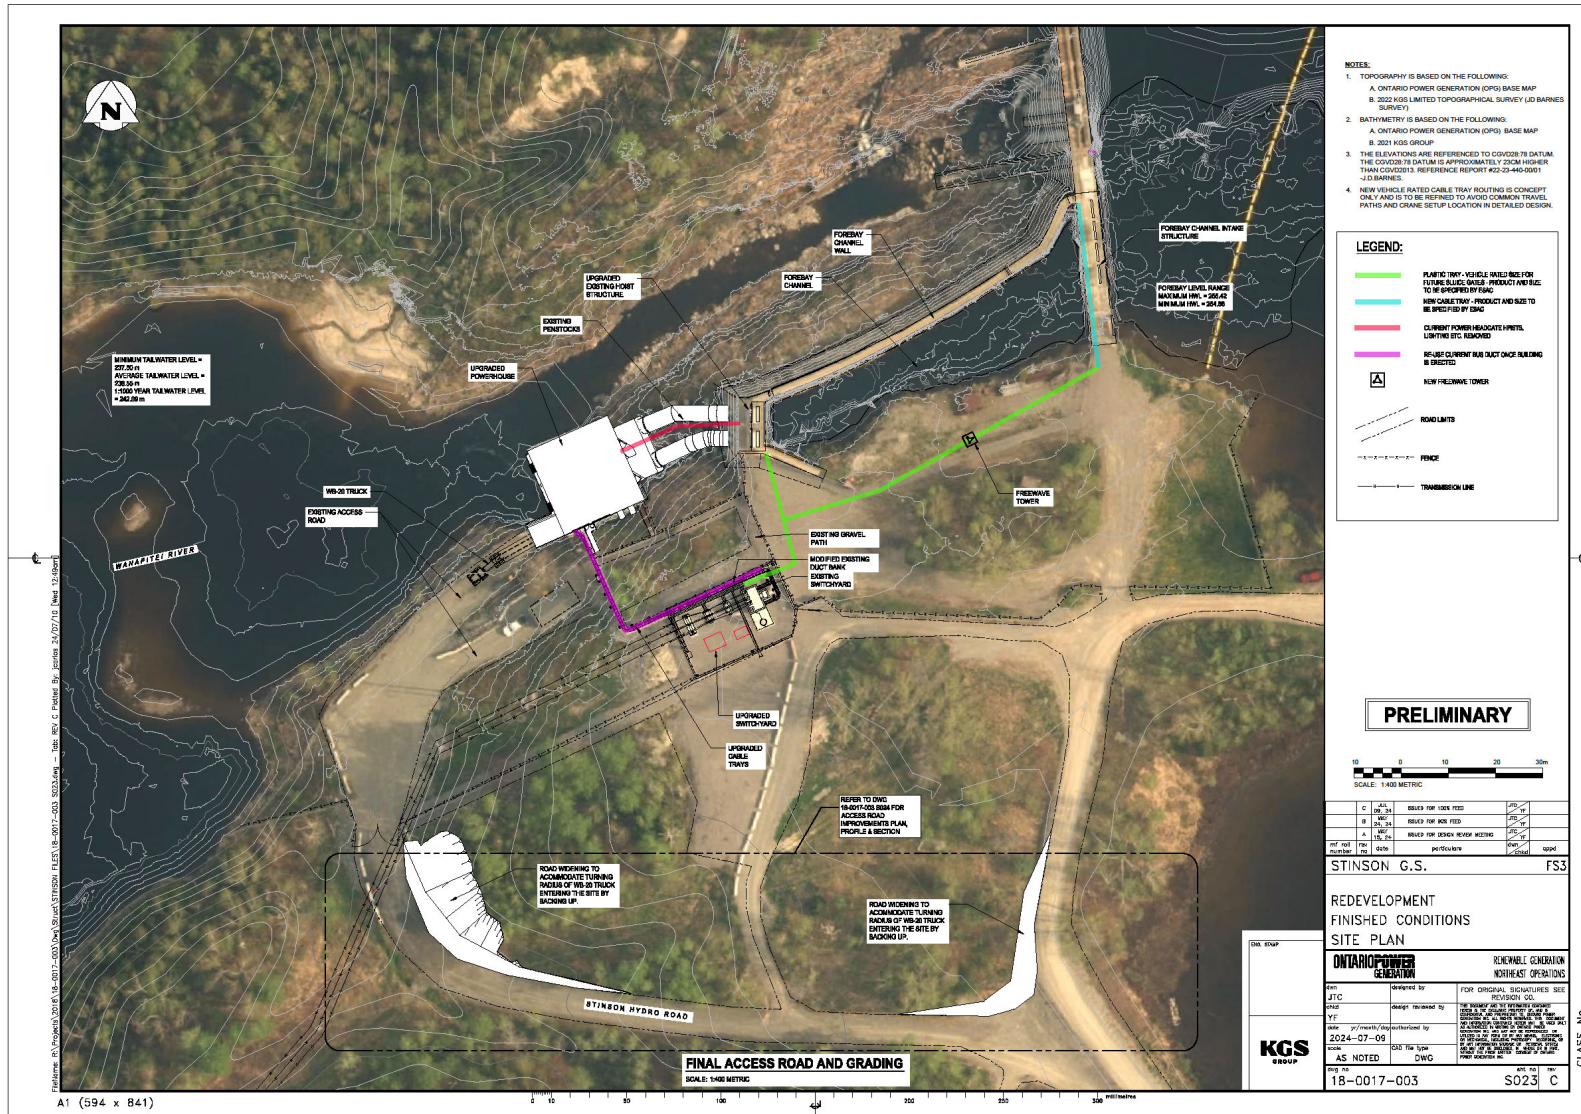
Proposed General Arrangement Site Plan for the Stinson GS
